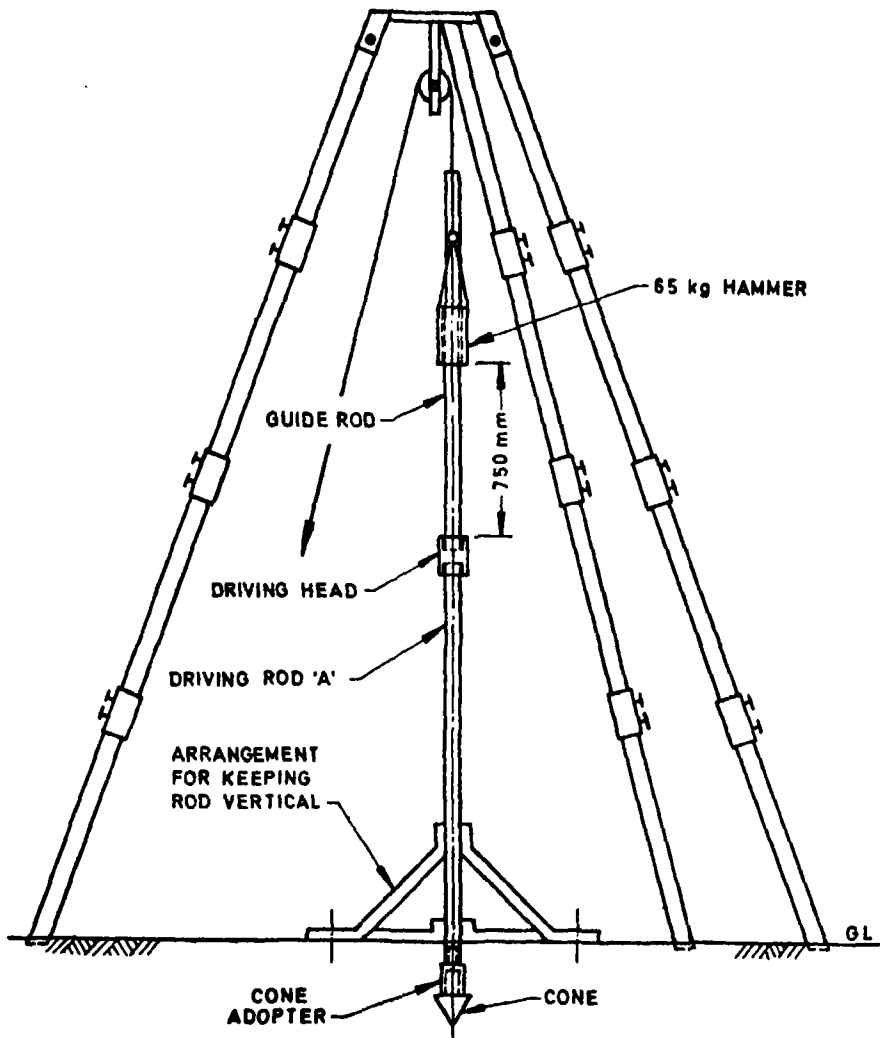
TYPICAL ASSEMBLY OF EQUIPMENT FOR
